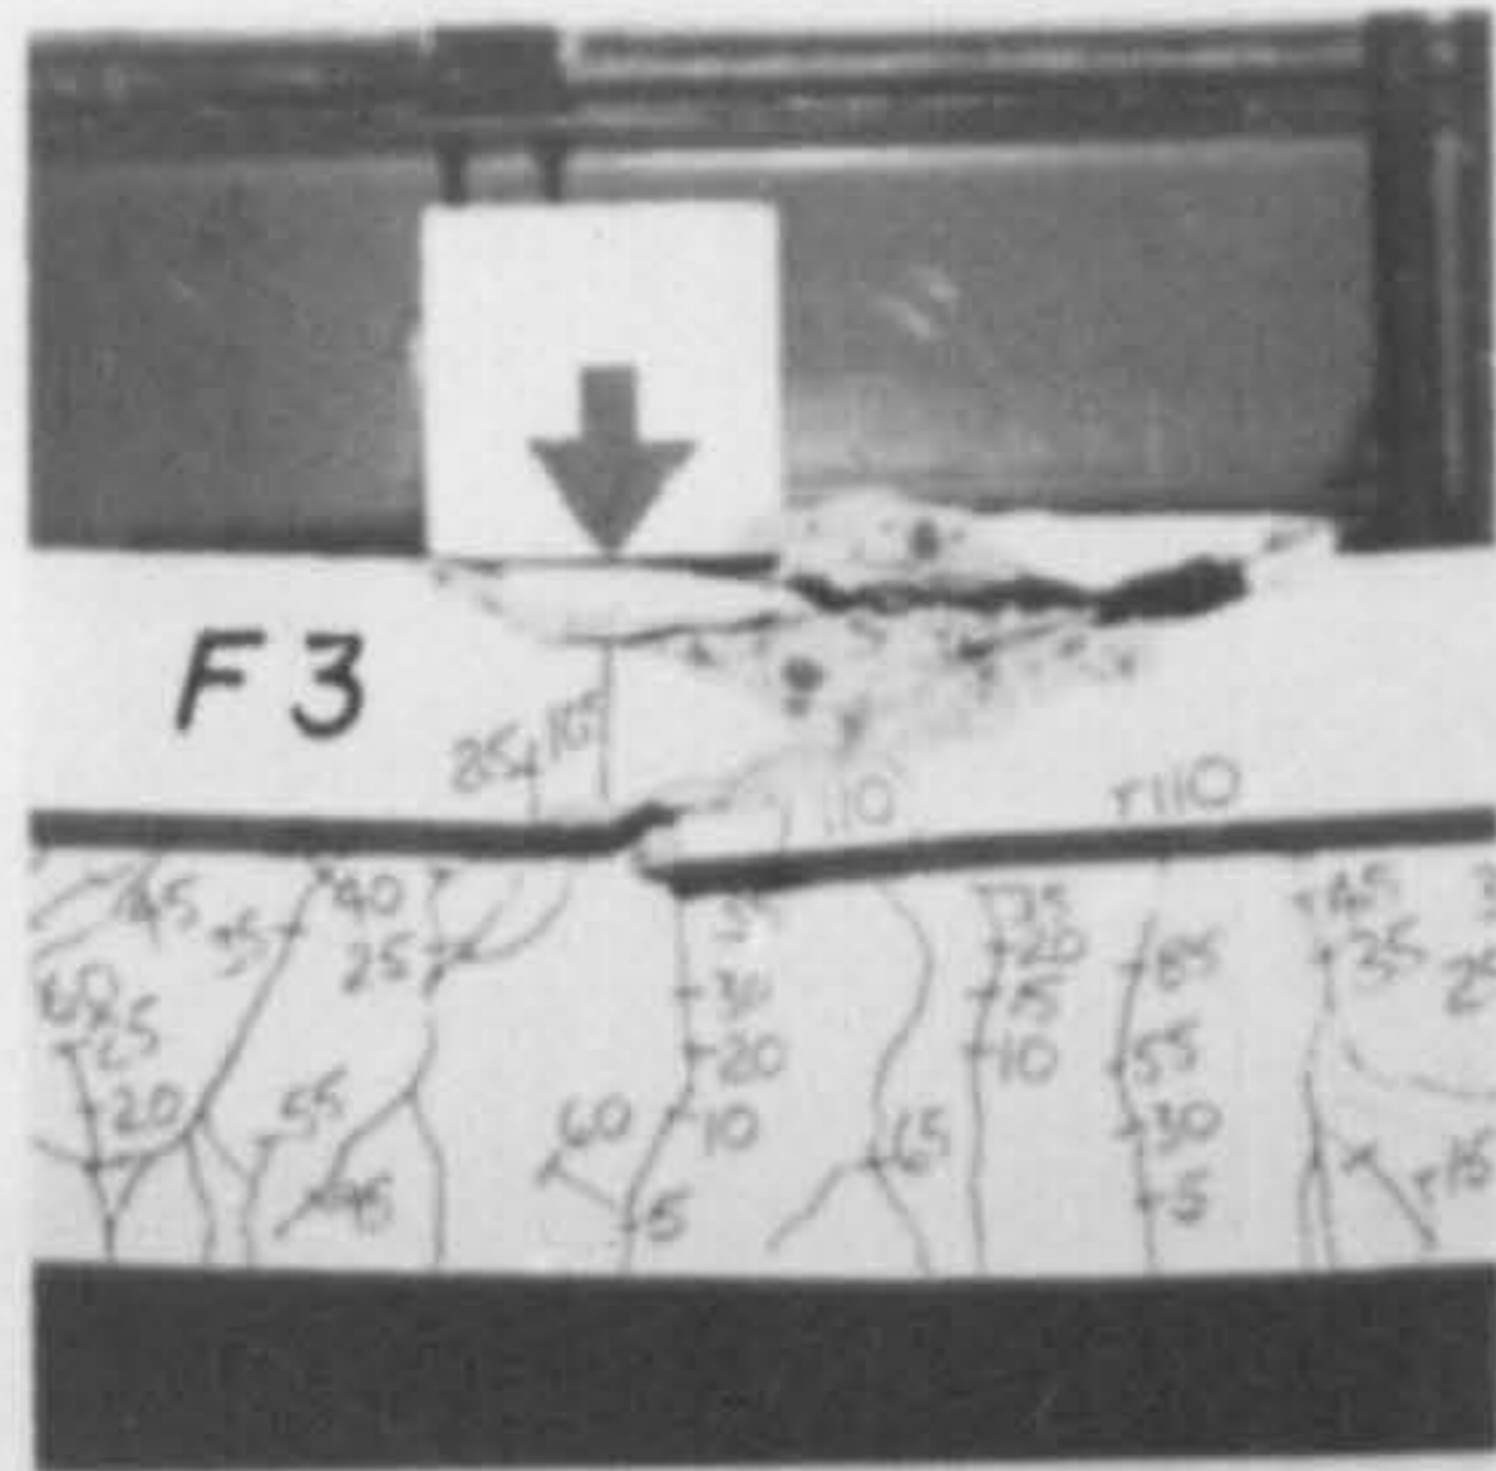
COMPRESSION ZONE FAILURES IN FLEXURAL BEAMS
